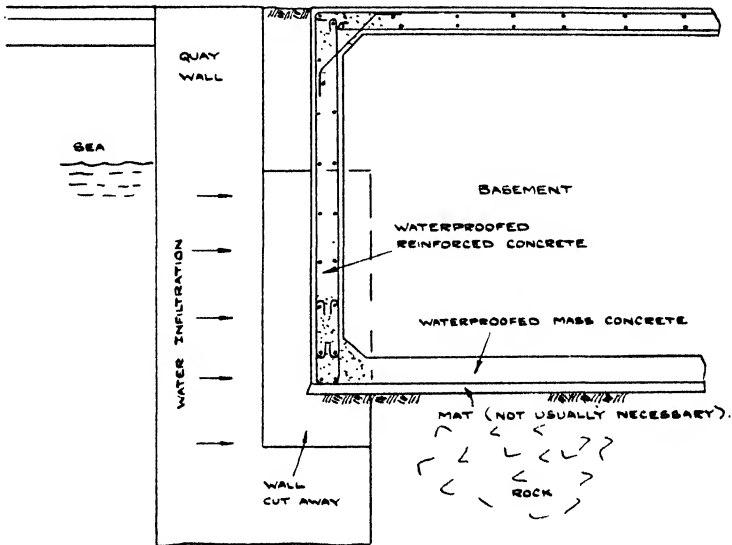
TYPICAL BASEMENT ON ROCK WITH MASS CONCRETE WALL
